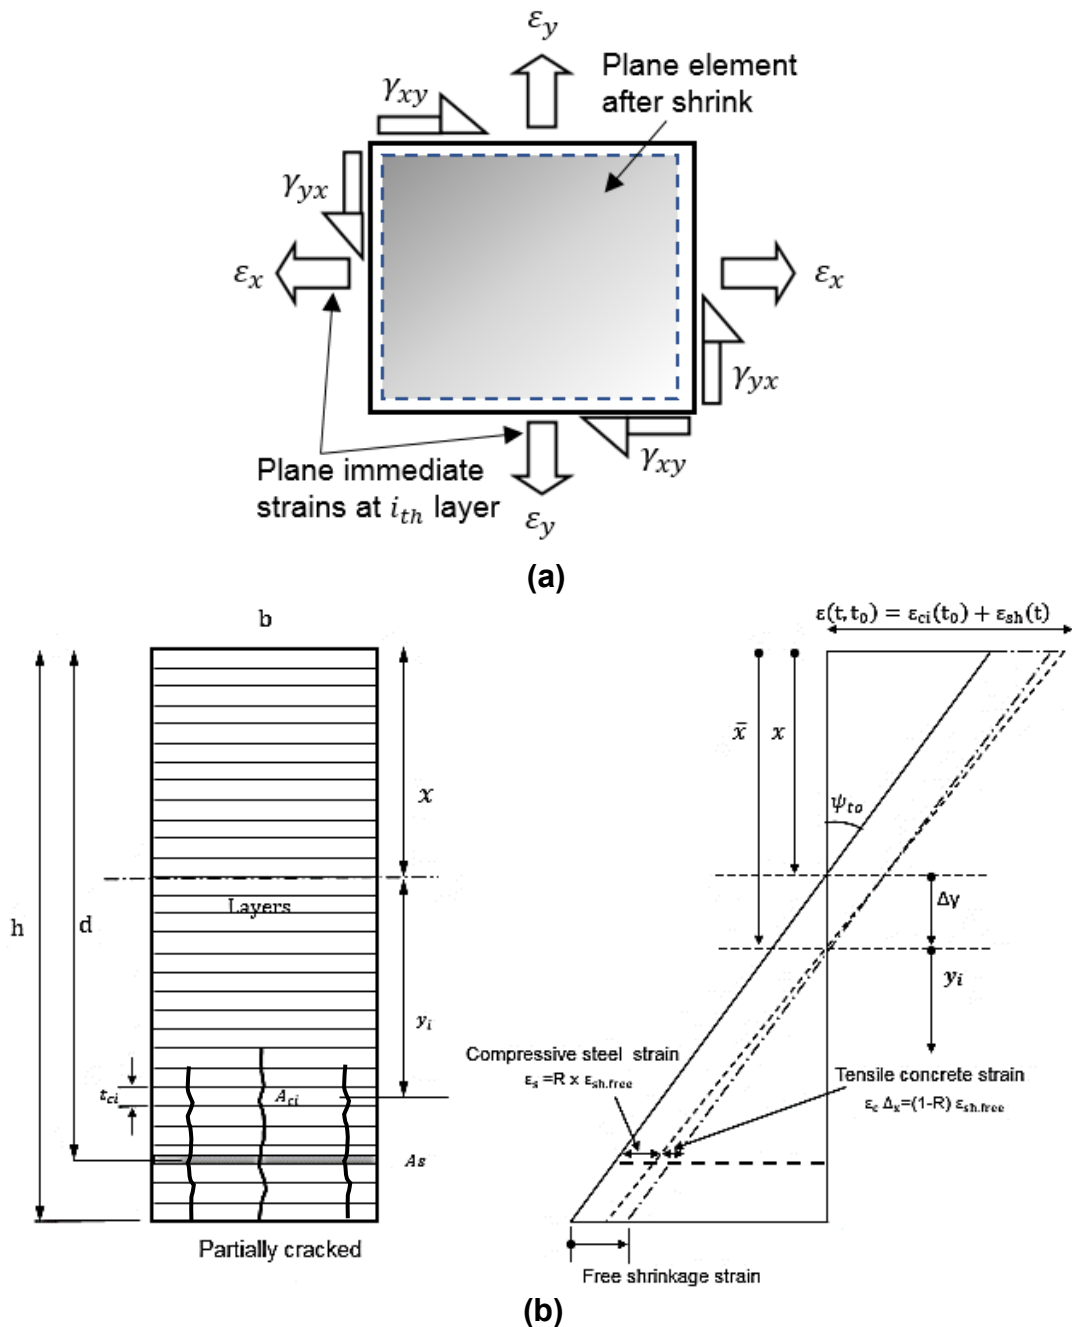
Shrinkage action at plane element (a), and restraint to shrinkage provided by reinforcement (b)
